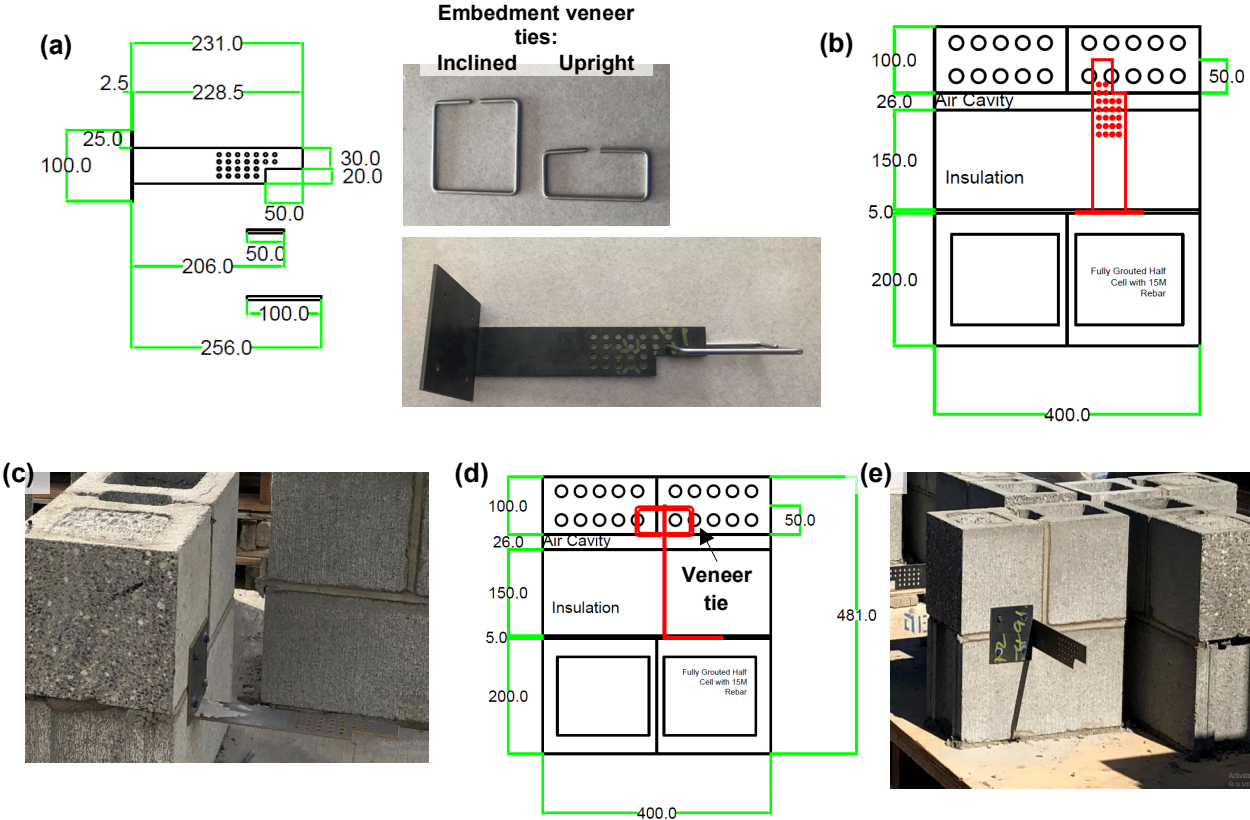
Plated connector illustrations (a) plated connector including embedment veneer ties, (b) wall cross-section with lying connector, (c) wall specimen without brick veneer, (d) wall cross-section with upright connector, (e) wall specimen without brick veneer . All dimensions in mm.
